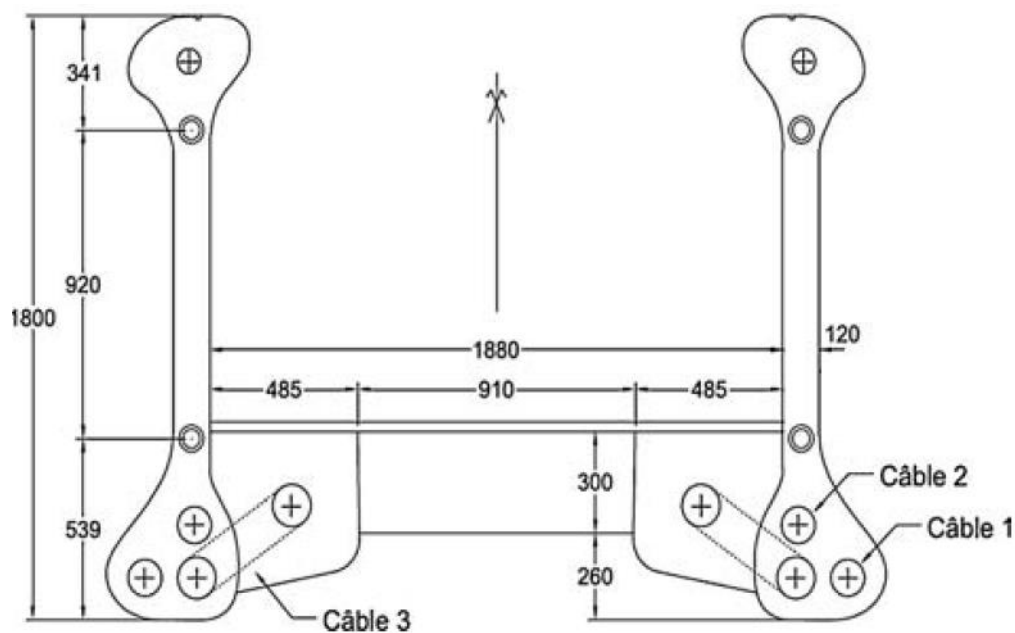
The cross-section dimensions of the Pont du Diable footbridge (Fehling et al., 2014).
